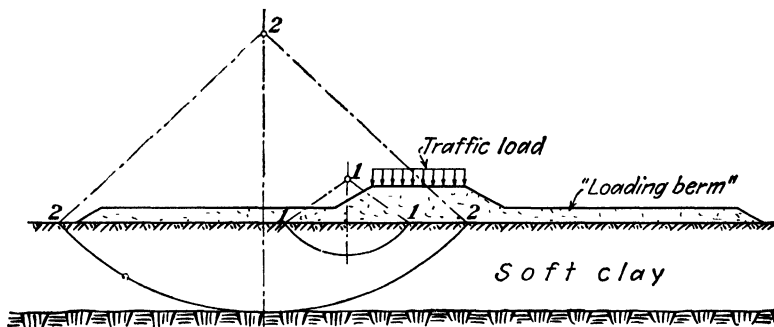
The use of loading berms to permit the construction of railway or highway embankments on beds of soft clay in Sweden. (After B. Jakobson, Ref. 185, 1948.)
